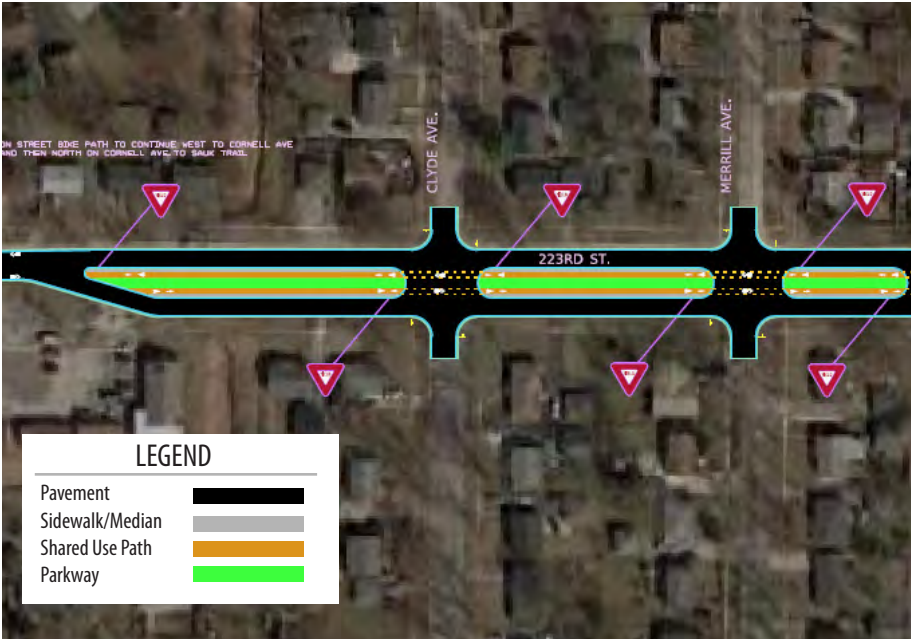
Diagram of Proposed 223rd Street Bikeway
